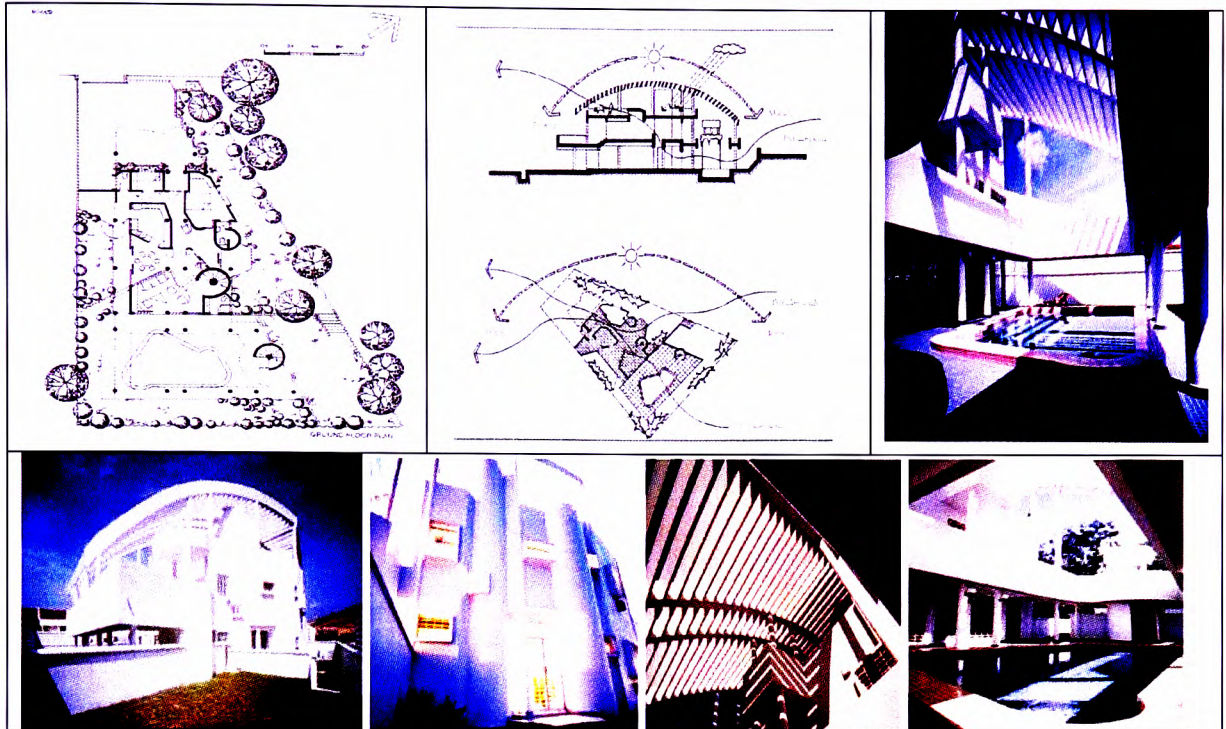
47: plan, section, site plan and elevations of the Roof-Roof house.
